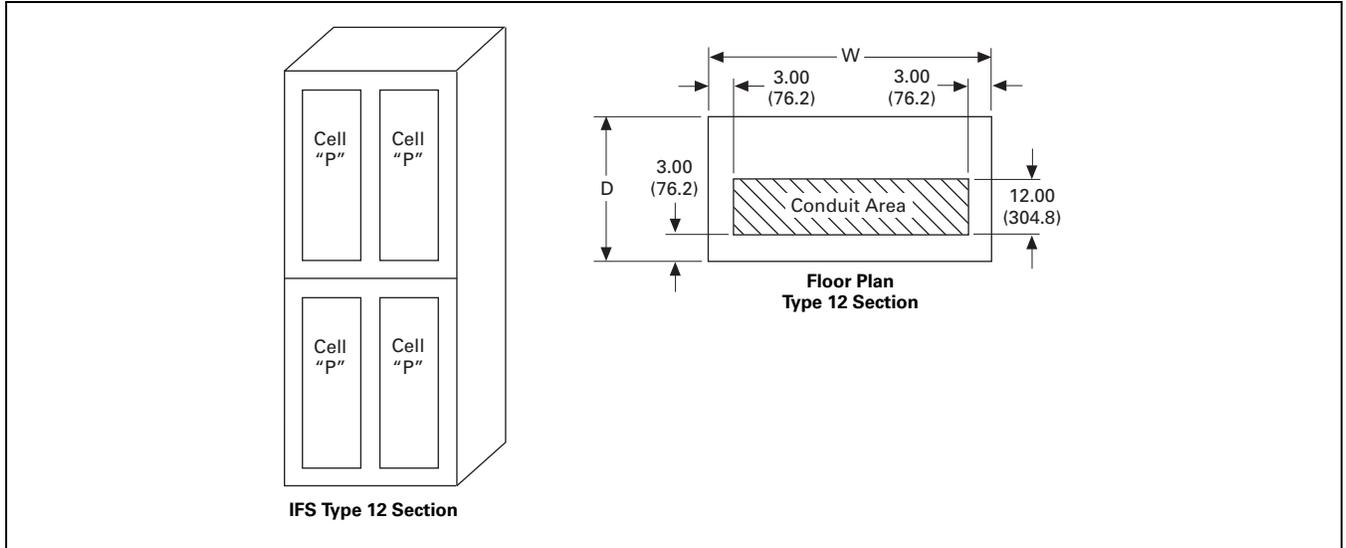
Type 12 Integrated Facility System Switchboards Distribution Section Layout—Dimensions in Inches (mm)
